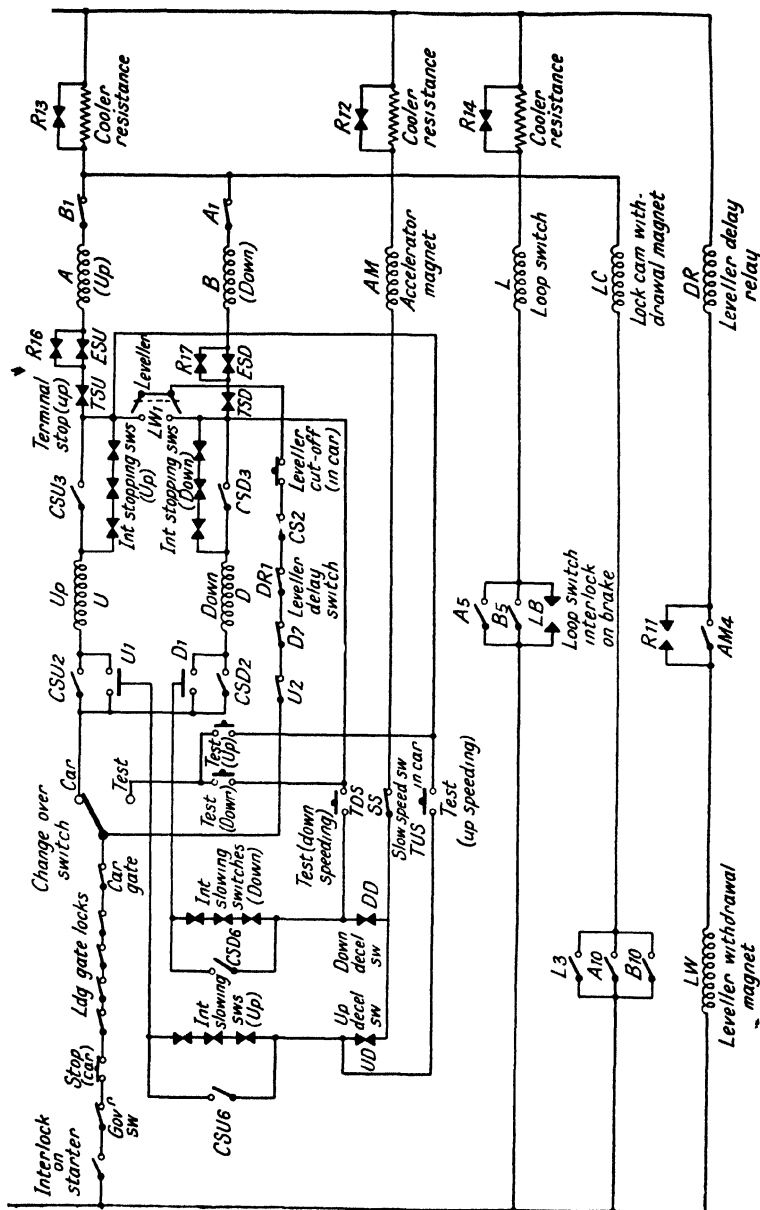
CAR SWITCH VARIABLE VOLTAGE GEARLESS MOTOR CONTROLLER
